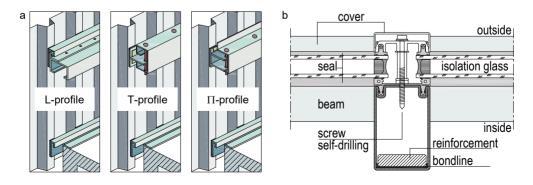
(a) Structures for bonded façade connections with different shape of connection profile; (b) Bonded façade reinforcement Bonded façade reinforcement
